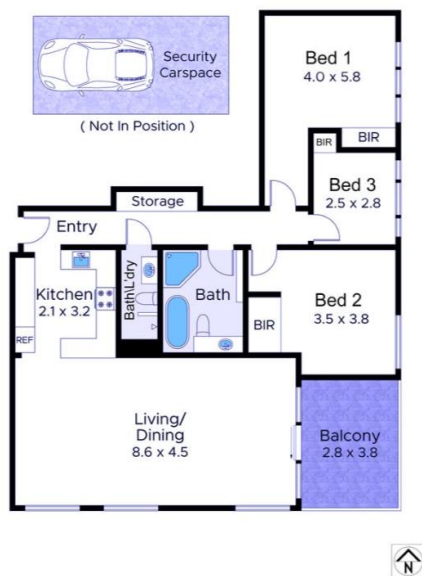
Typical floorplan of units on south-east side of 74-80 Reservoir Street
